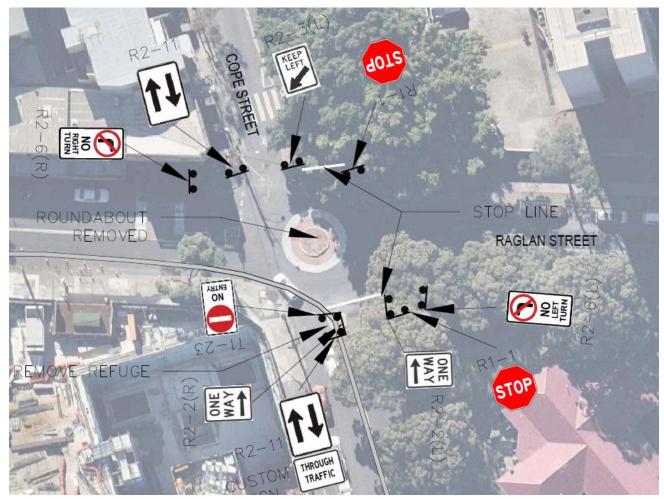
Cope Street / Raglan Street CTMP Layout
